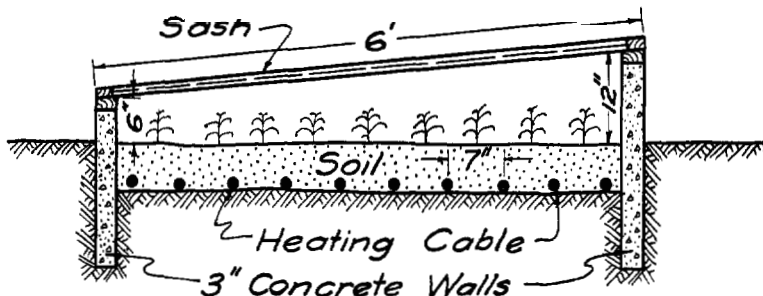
Cross section of an electrically-heated hotbed showing cable six inches below surface of soil.
